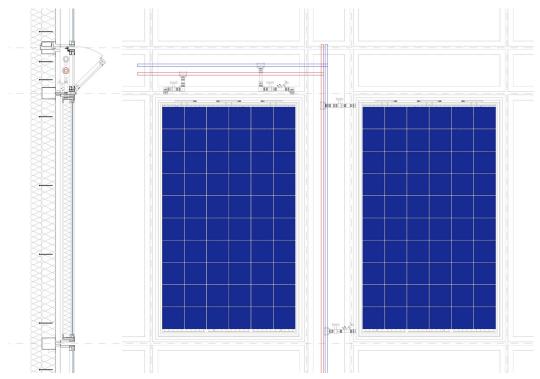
Distribution of hydraulic infrastructure, connecting PVT panels in vertical and horizontal access zones. Elevation view (right) and vertical section (left).
